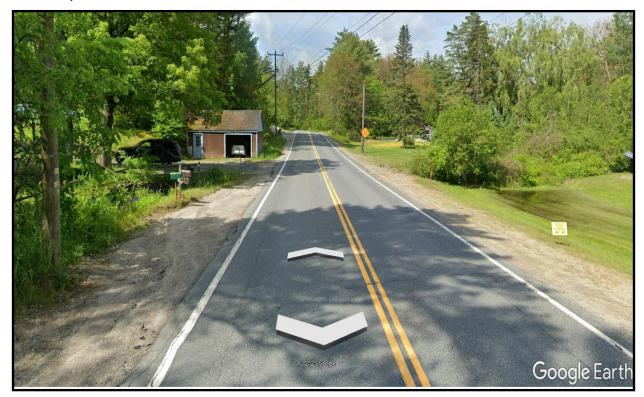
Roadway Shoulder on Inlet Side (4/28/23) J. Commerford
